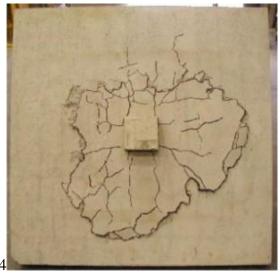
Plan View of Punching Shear Cracks in a Test Specimen at University of Waterloo, Ontario. (Curtis, 2013)
